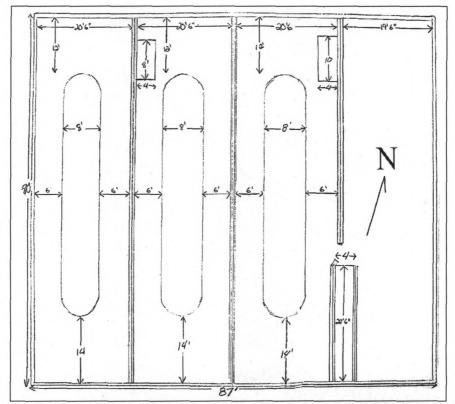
Second floor mezzanine plan, 520-526 East Grand (James Boyt, 1974)
